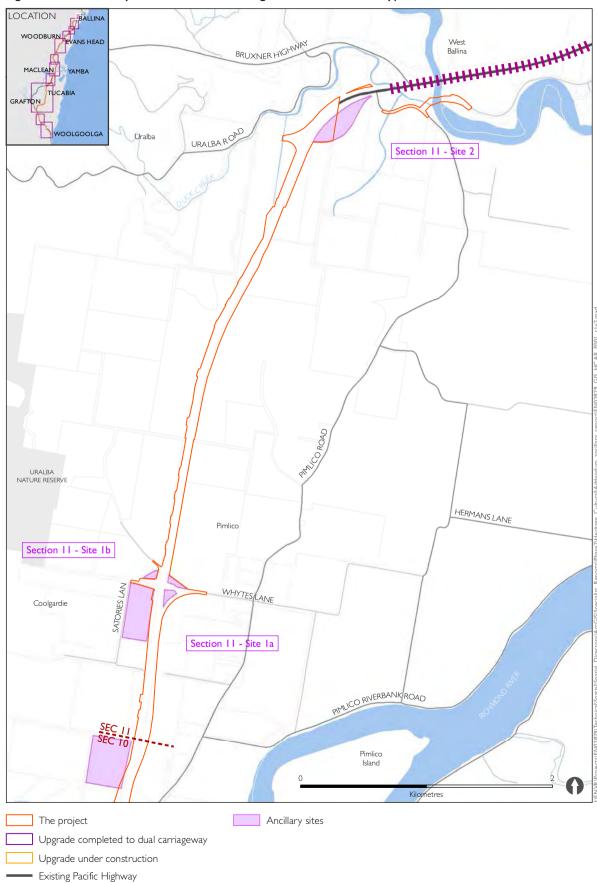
Ancillary sites: Section II - Coolgardie Road to Ballina bypass
